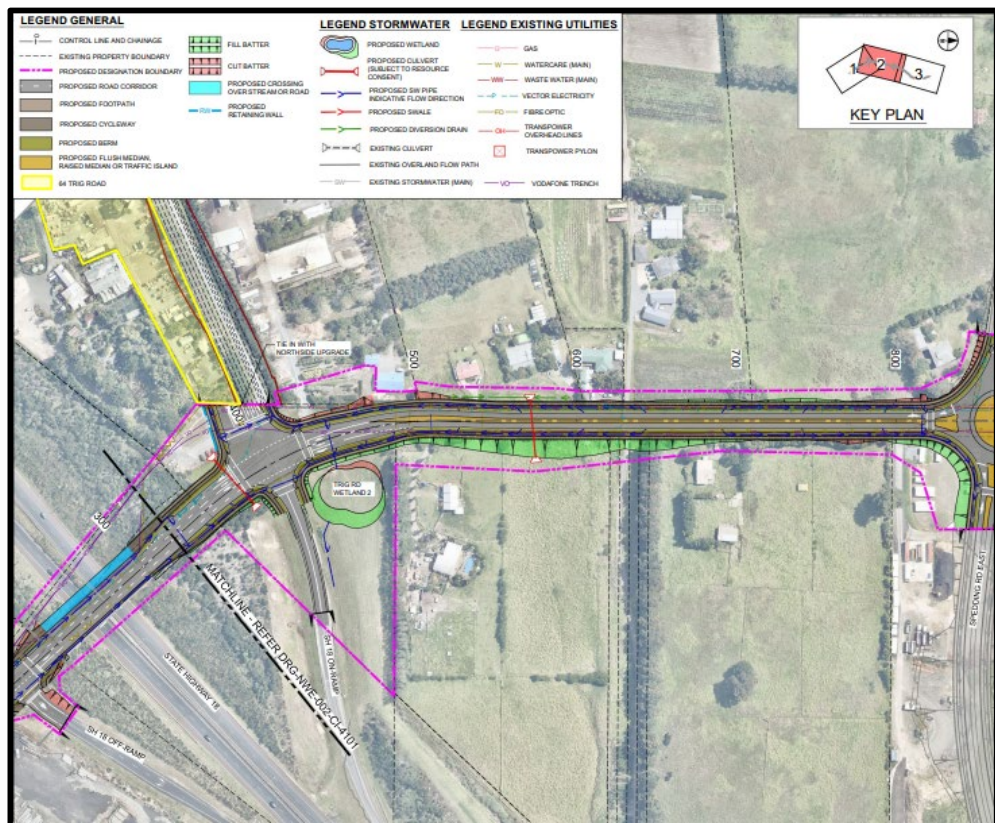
Annotated general arrangement layout plan identifying 64 Trig Road in yellow
